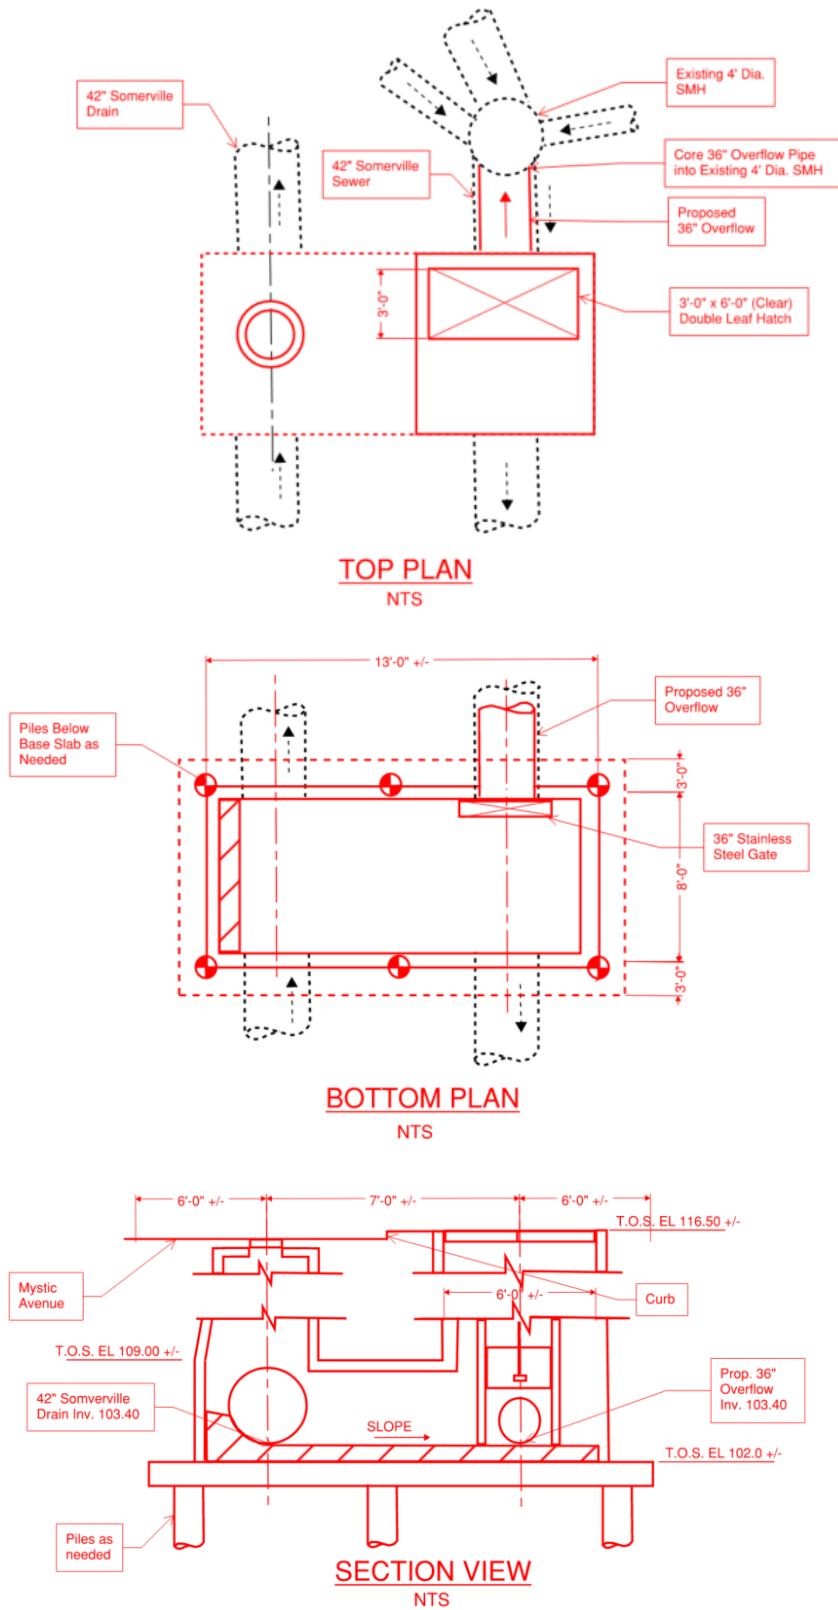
Alternative 2.1 Chamber Plans and Section
